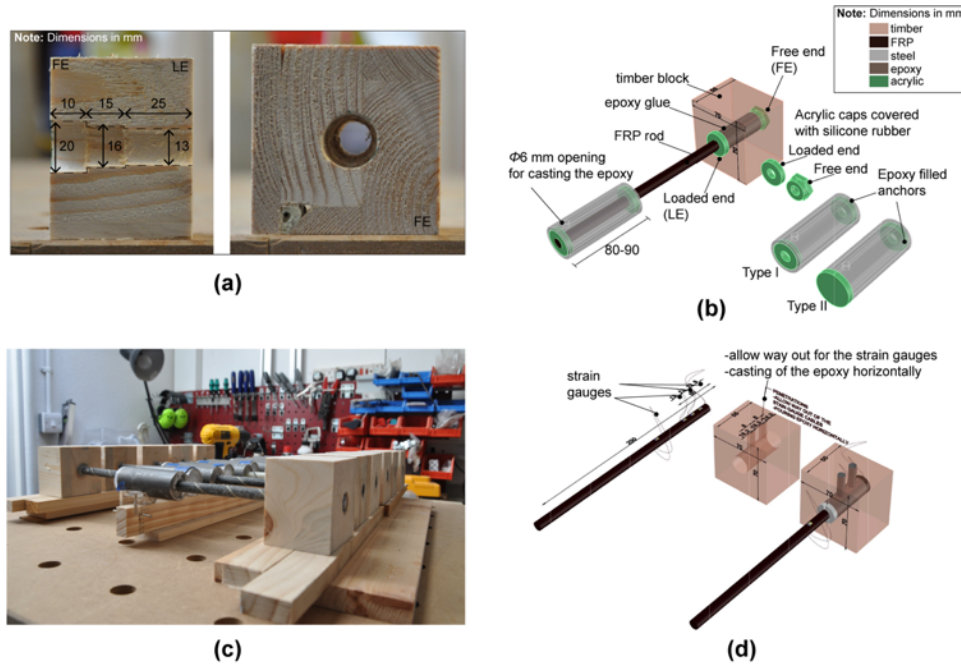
(a) Wedge geometry in glued in FRP rod specimens, (b) specimens with strain gauges along the bonded length, (c) ‘pull-compression’ test specimen and (d) alignment rig during epoxy curing.
